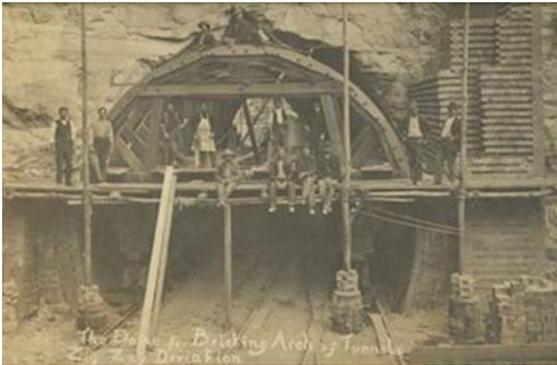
Tunnel 9: Construction of brick buttress at tunnel portal.
